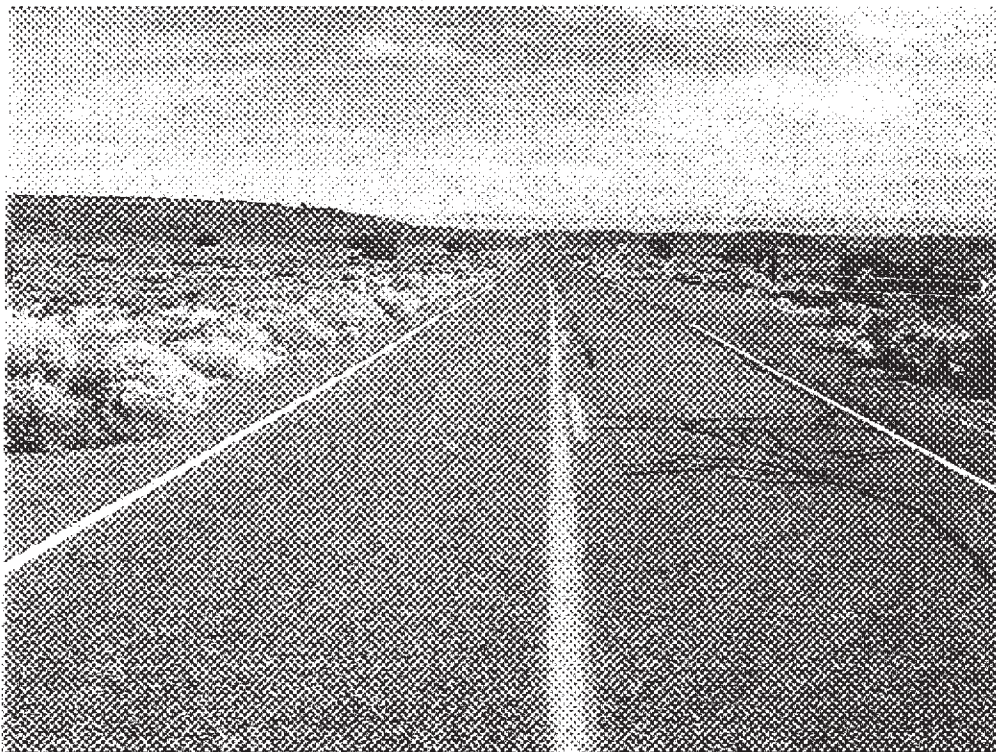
MP 15.24 S. Boundary of WUPA, Typical Pavement Distresses (looking back-chainage)
